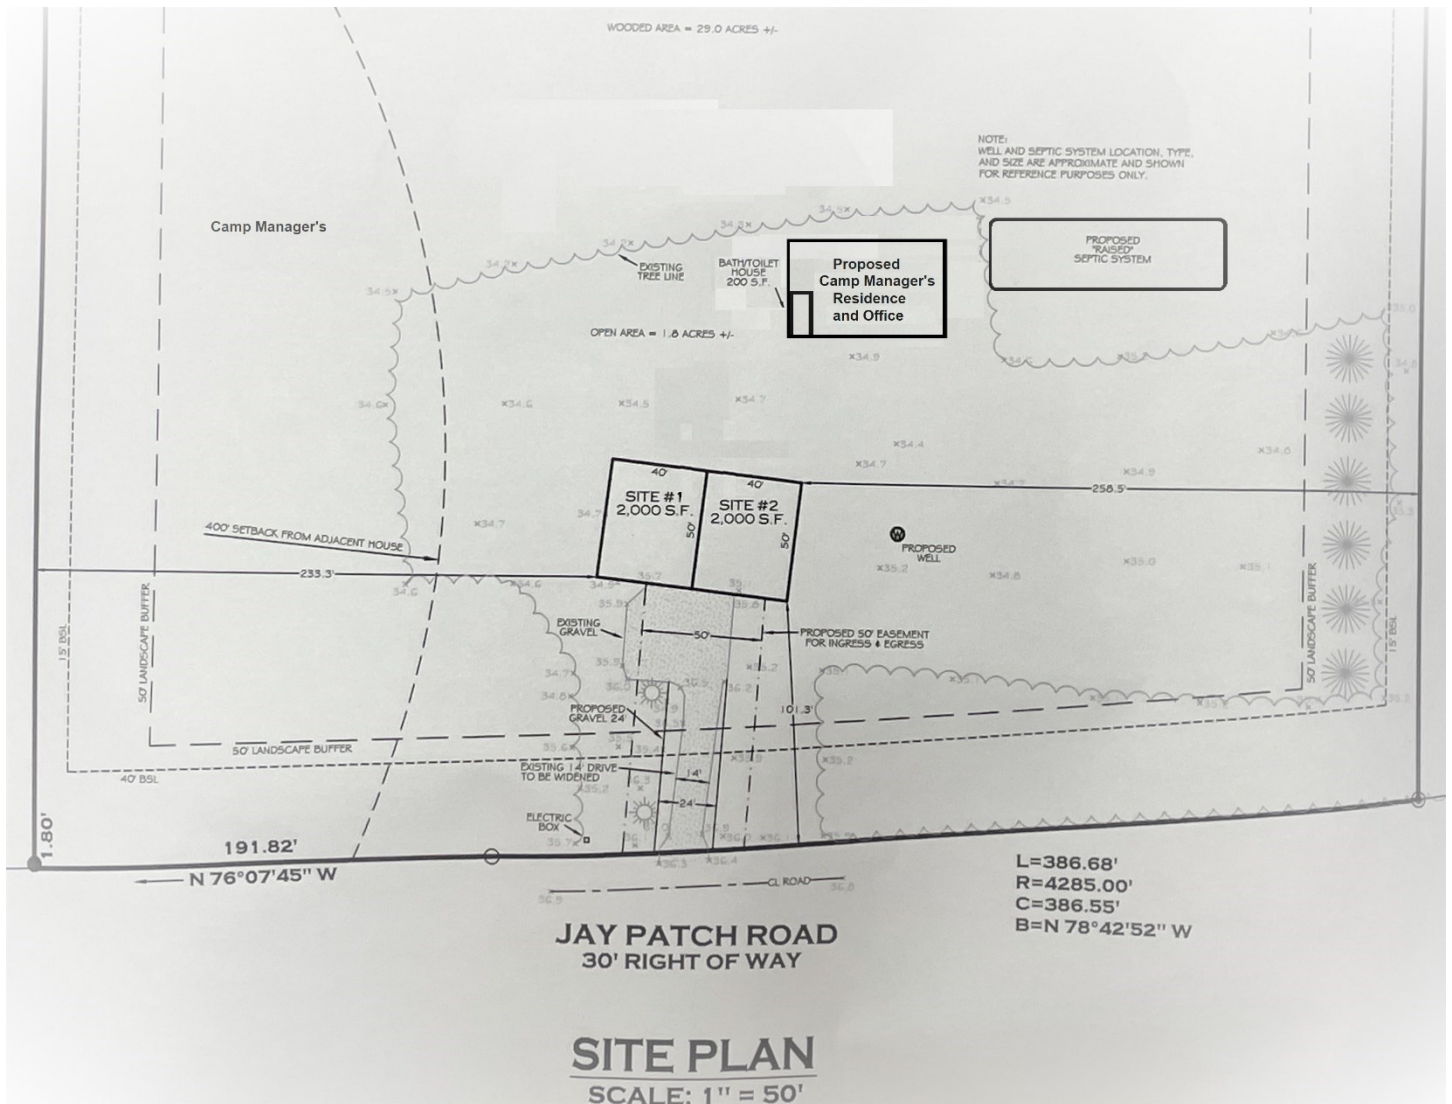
Site Plot A- Schematic of Overall Campground Layout
